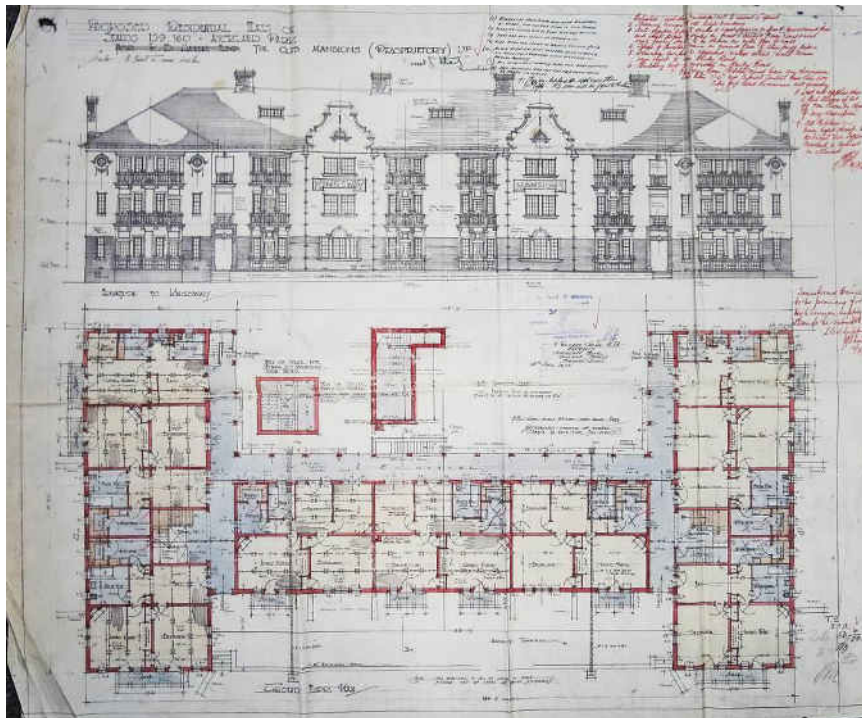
Original plan for proposed residential flats along Kingsway Avenue from 1928\_ plans were drawn by the well-known architect P. Rogers Cooke (Source: City Council of Johannesburg, Plans Archive)
